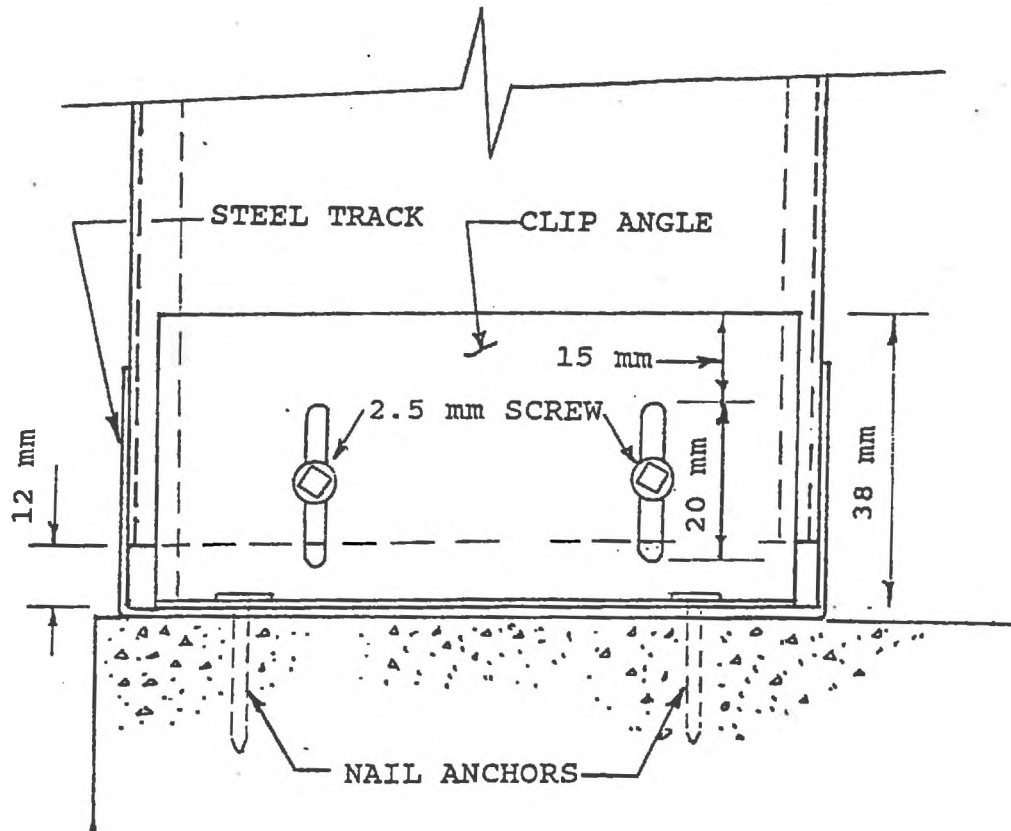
Typical Clip Angle Connection Detail Used for Series D7
